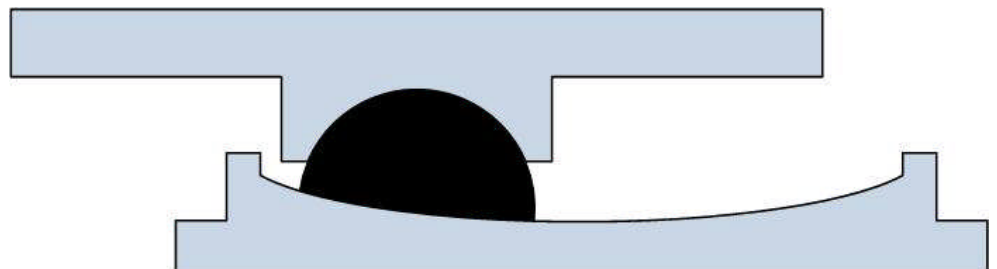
Sketch of a Friction Pendulum Bearing
